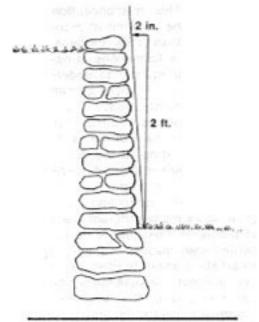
A rock garden wall should slope backwards 1 inch for every vertical foot.
